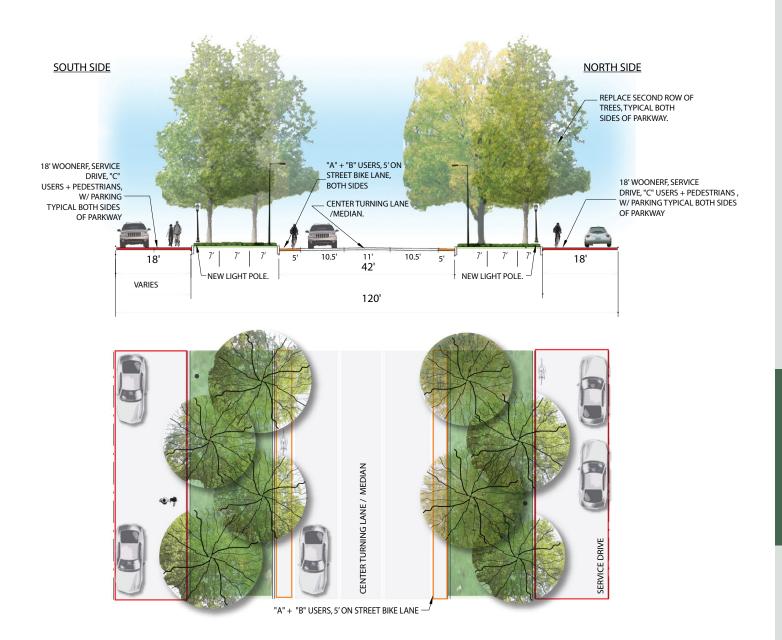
Southwestern Parkway: Zone 4-6 Prototypical Section & Plan
